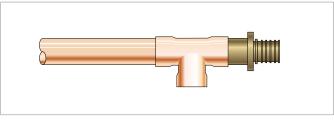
RAUTITAN RX soldering/pressing adapter with copper piping system
